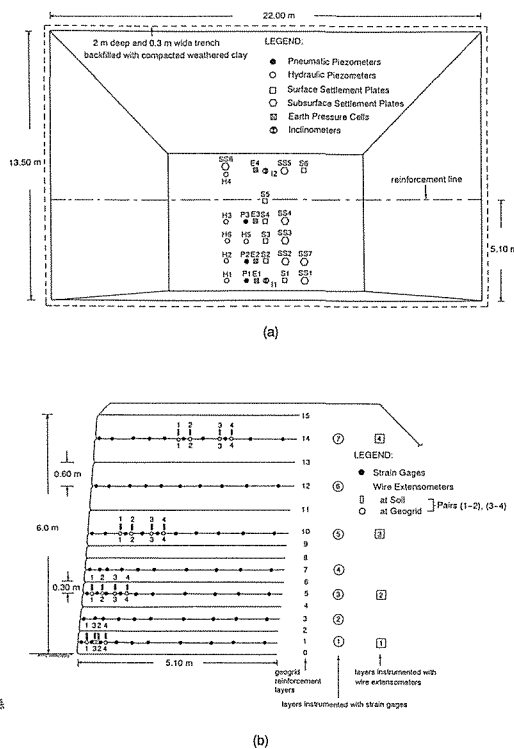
Layout of Foundation Instrumentation of Test Facility II
